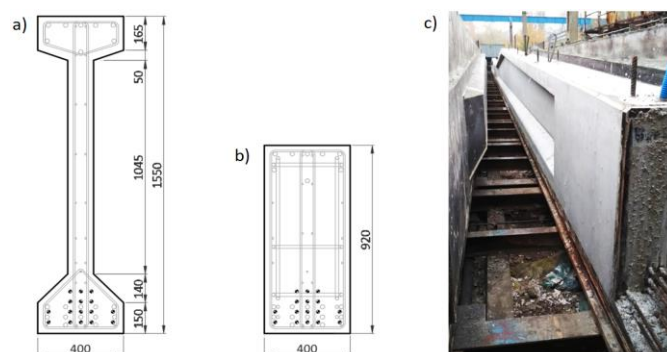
a) Midspan, b) front cross section and c) side view of monitored prestressed-concrete girder.
